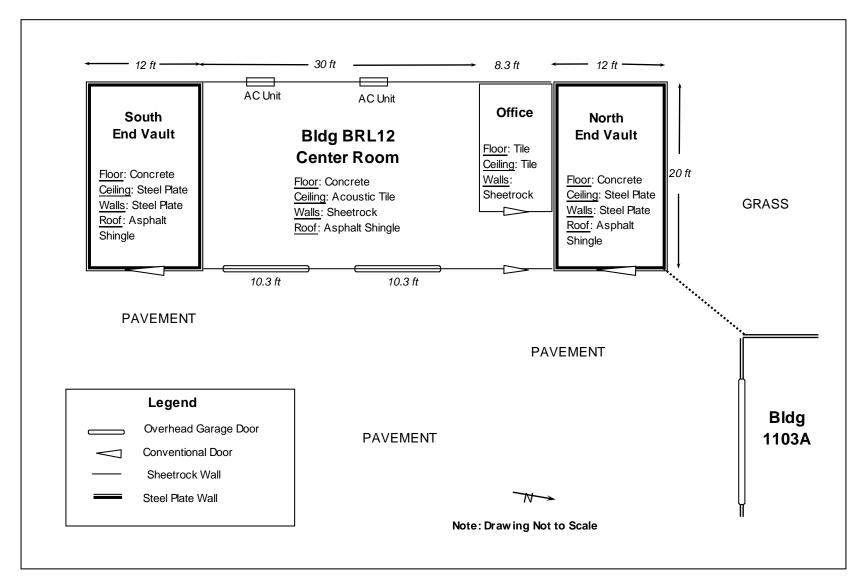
BUILDING BRL12 FLOOR PLAN
